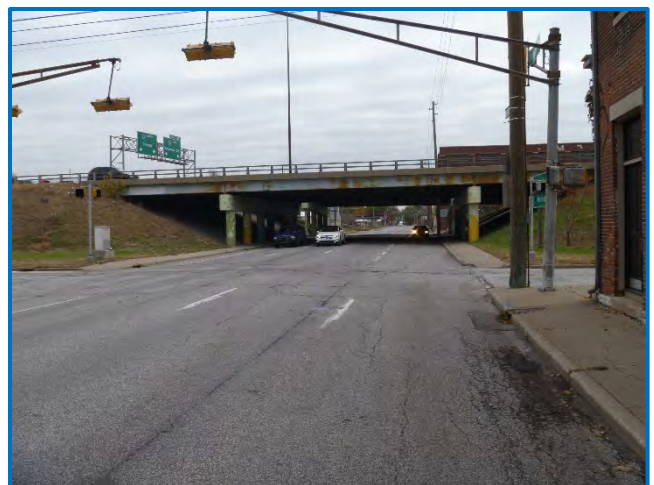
View of the I-65 bridges over Michigan Street facing east (10/30/2015).
